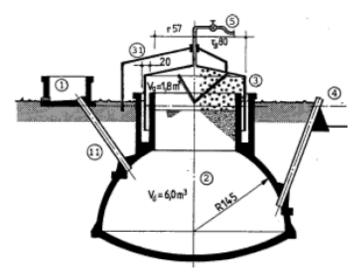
Water-jacket plant, 1-mixing pit, 11-fill pipe, 2-digester, 3-gasholder, 31-guide frame, 4-slurry store, 5-gas pipe [39]
